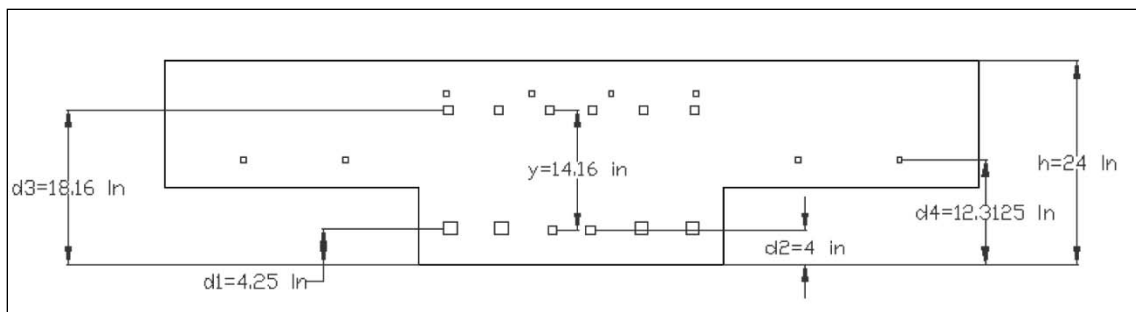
Cross section of the interior beam at mid-span steel rebar locations.
